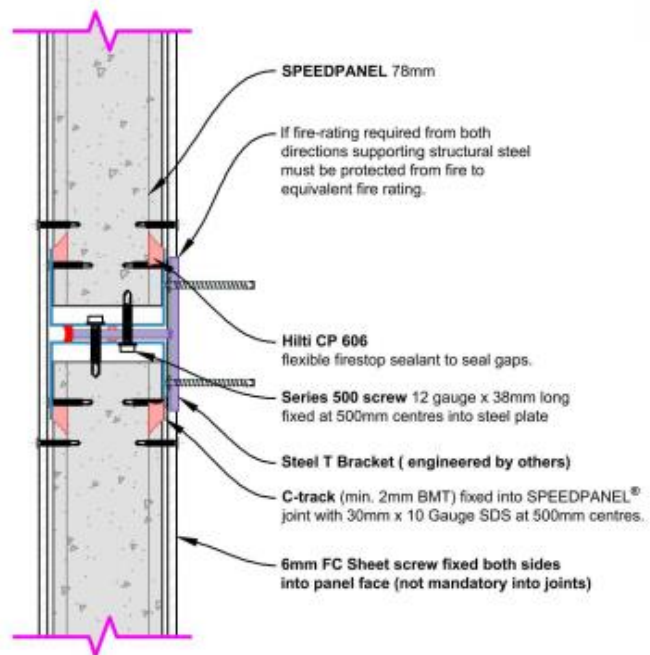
B: Back to Back C-tracks- Connection Details - Alternative-2
